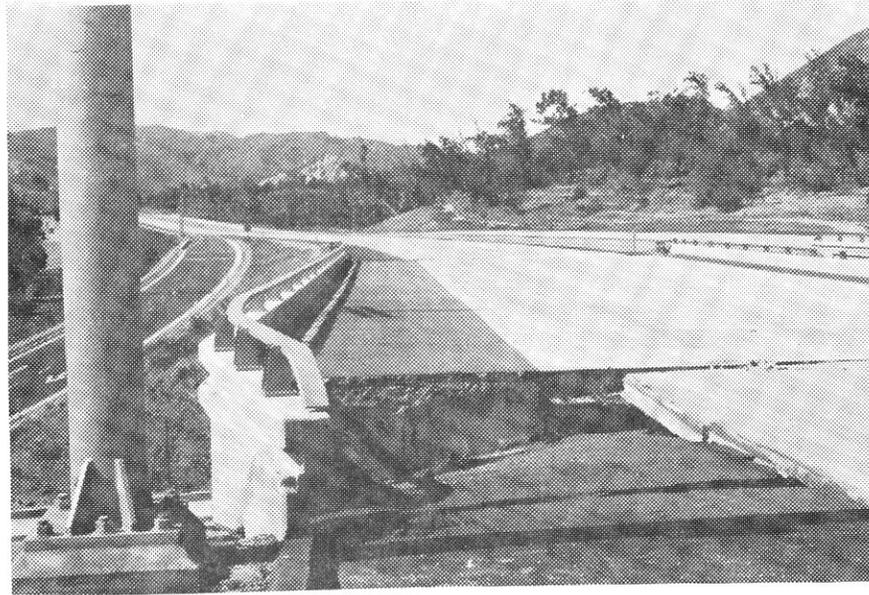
Looking west at the eastbound structure of the Roxford Street Undercrossing. Note rotational movement of structure.
